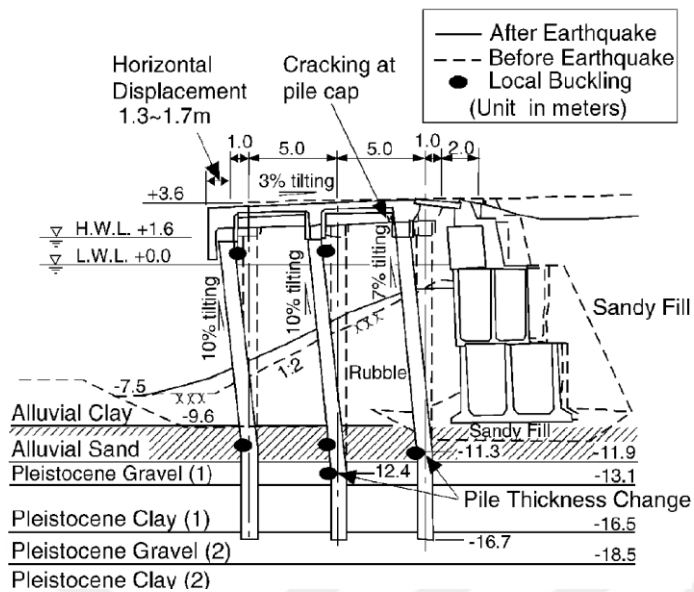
Cross-section of a pile supported wharf (PIANC, 2001)
